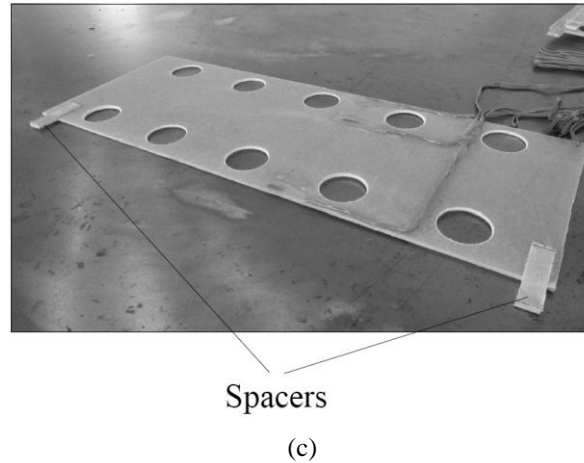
Manufacturing process of sandwich panels: (c) detail of connector with spacer.
